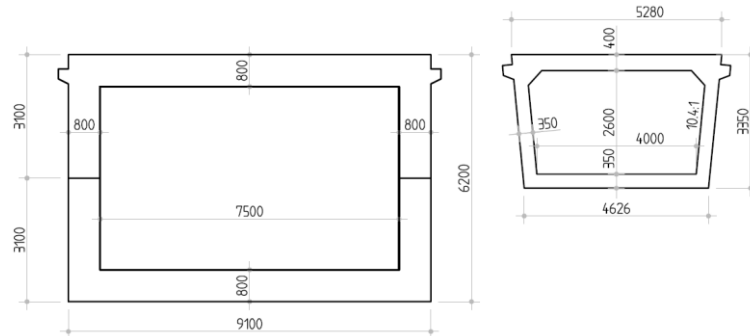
Cross-section underpass - Layout I: Left underpass for the motorway, right underpass for cyclists
